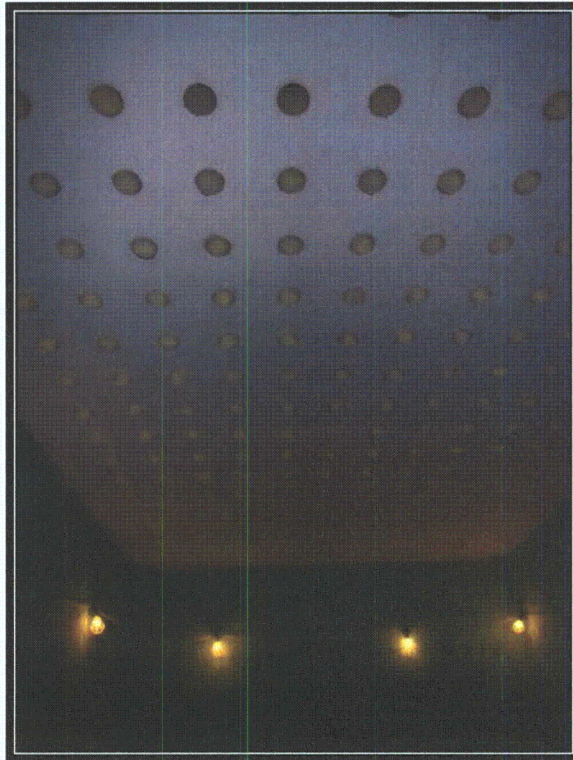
Underside of floor of new fuel storage room (Photograph by RCG&S, 2008)
